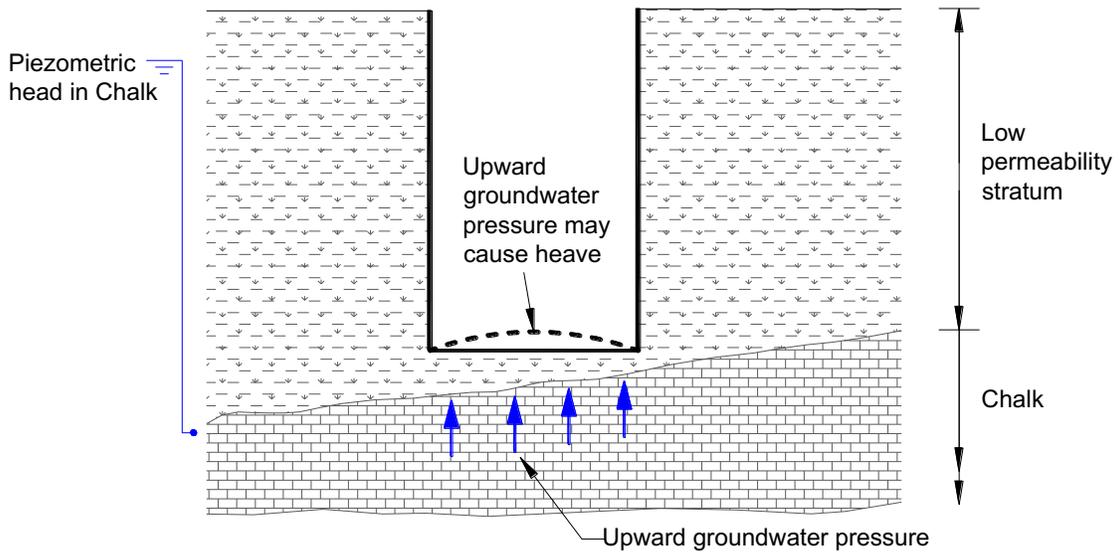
Risk of hydraulic failure of the base of excavations in strata overlying Chalk
